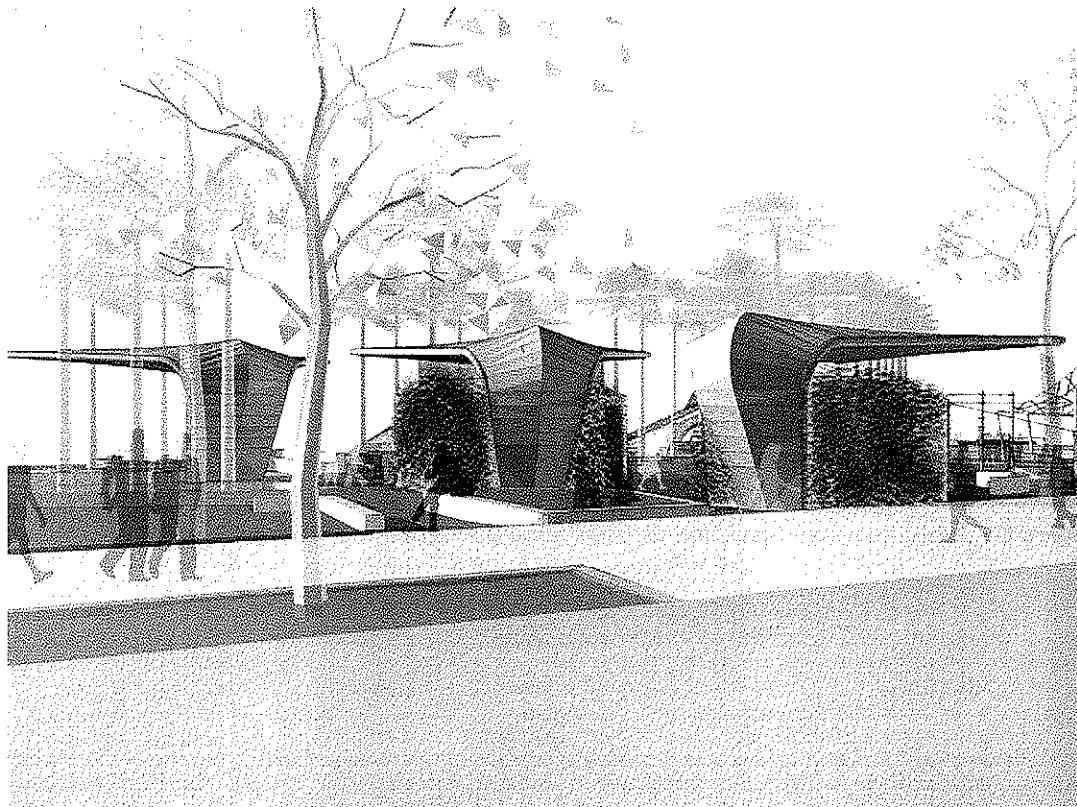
View of proposed shade structures from Pedestrian Boulevard and view through site
